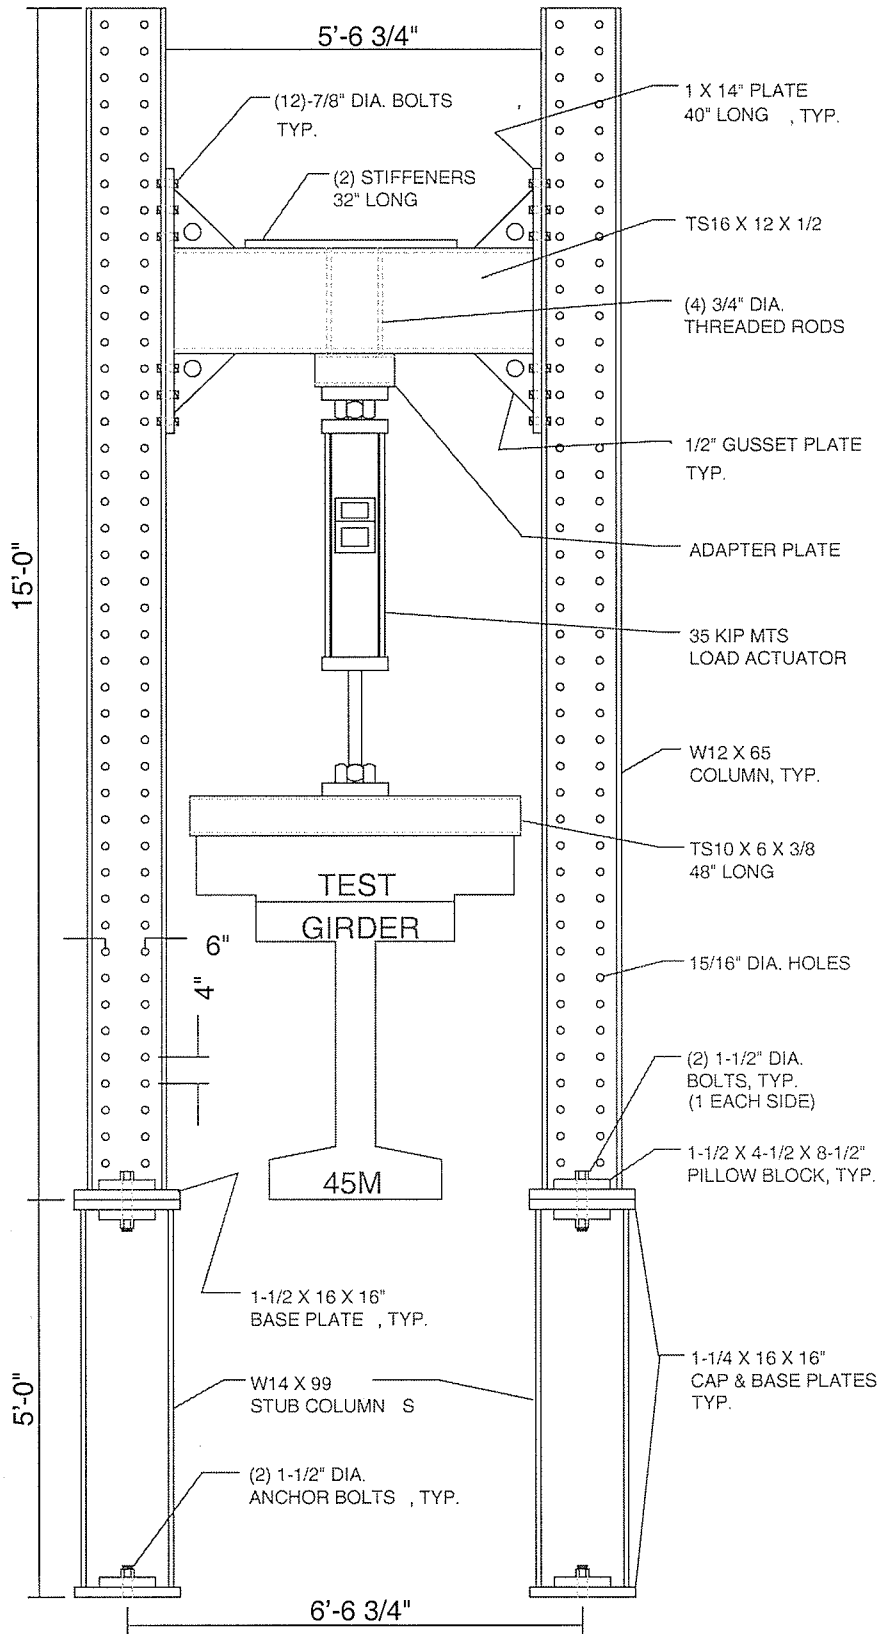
Load Frame Configuration for Static and Cyclic Load Testing
